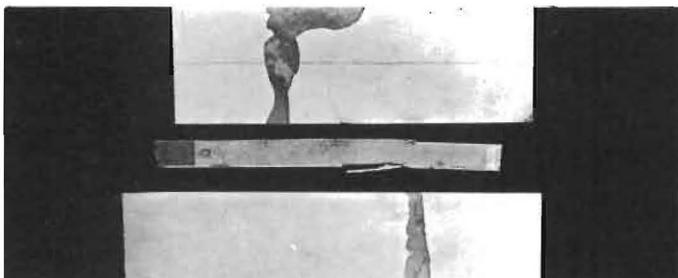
\_ FACE FAILURE OF PP\_ SANDWICH BEAMS AND PANELS IN FACE\_WRINKLING MODE
